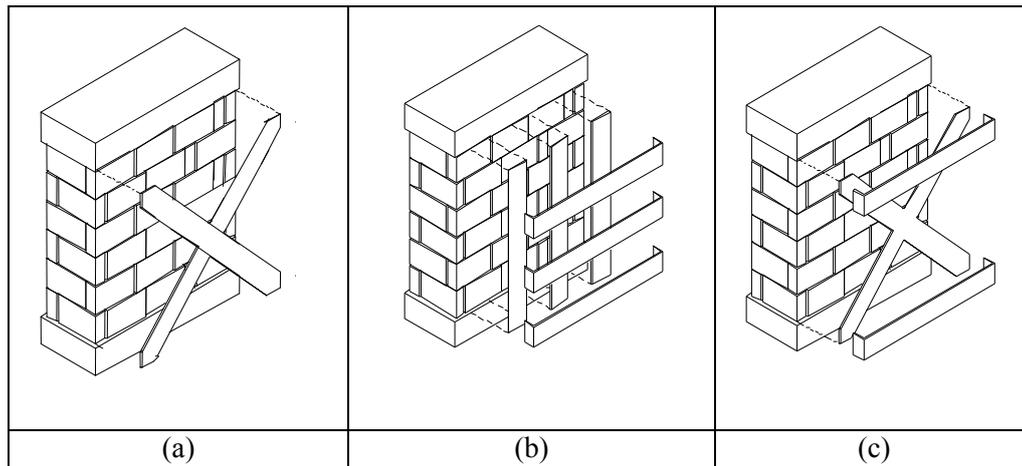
(a) Clay brick walls strengthened with cross layout (Zhao et al. 2003; Santa Maria et al. 2006), Tuff masonry walls strengthened with grid (b) and cross (c) layout (Marcari et al. 2007)
